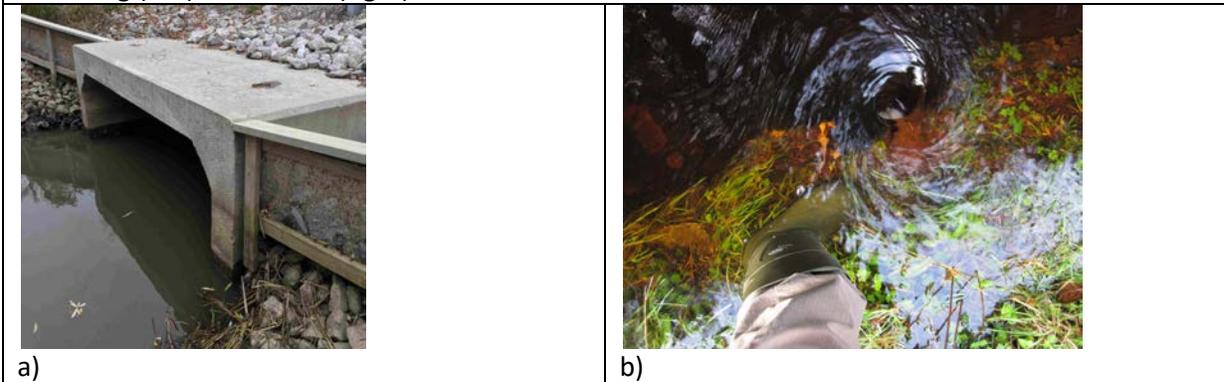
Wildlife tunnels should never be a) fully submerged as amphibians and reptiles require access to surface oxygen or b) have strong currents (e.g., due to an undersized culvert). Photo credit: Barb Beasley.
